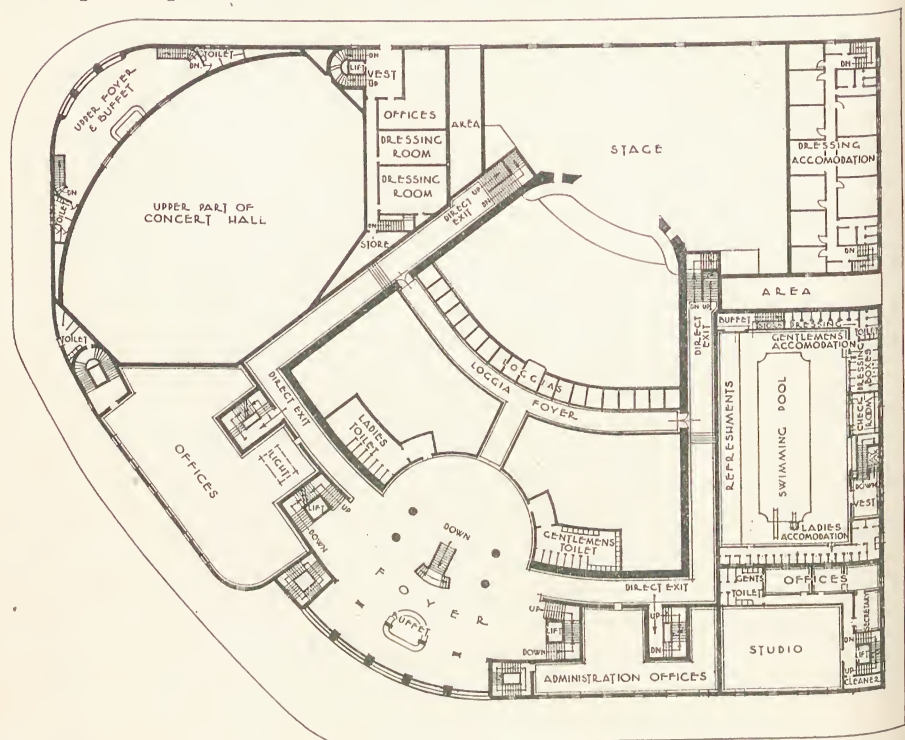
FIRST-FLOOR PLAN OF PROJECT FOR IMPERIAL MUSIC CENTRE
